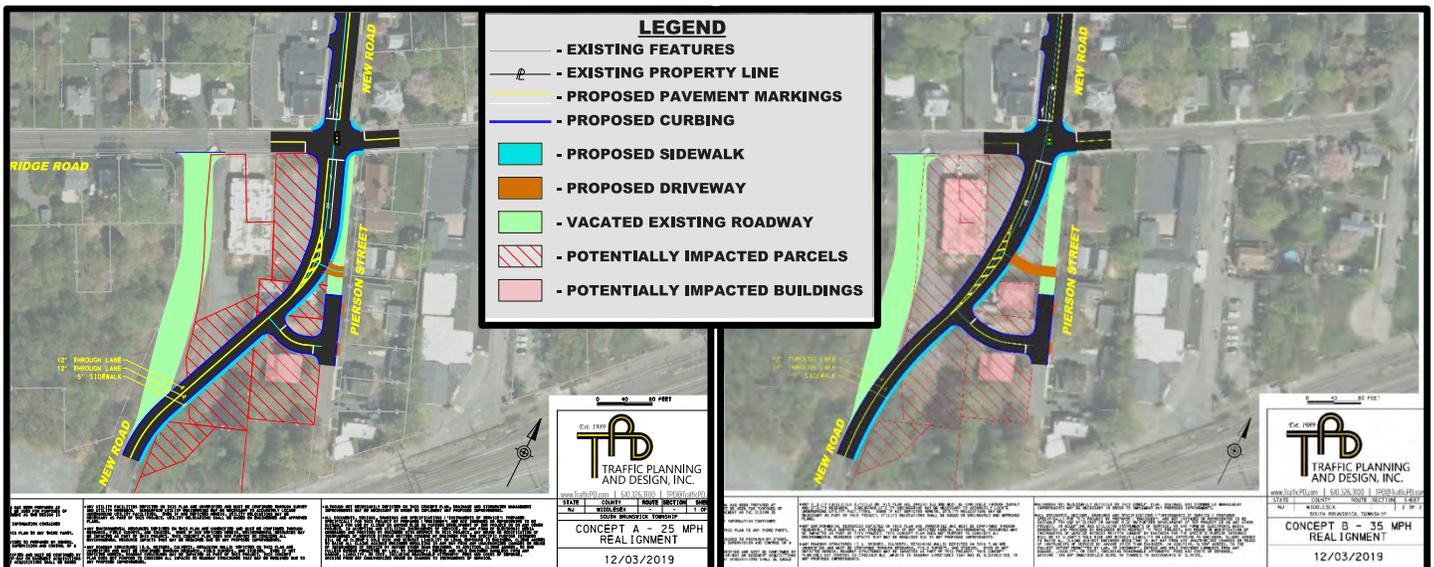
Concept of New Road Realignment at 25 and 35 MPH
